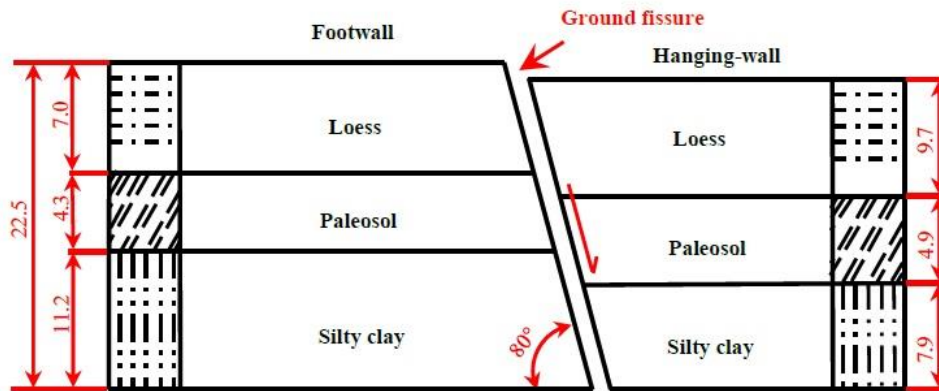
Section structural characteristics of the site with ground fissures (unit: m)
